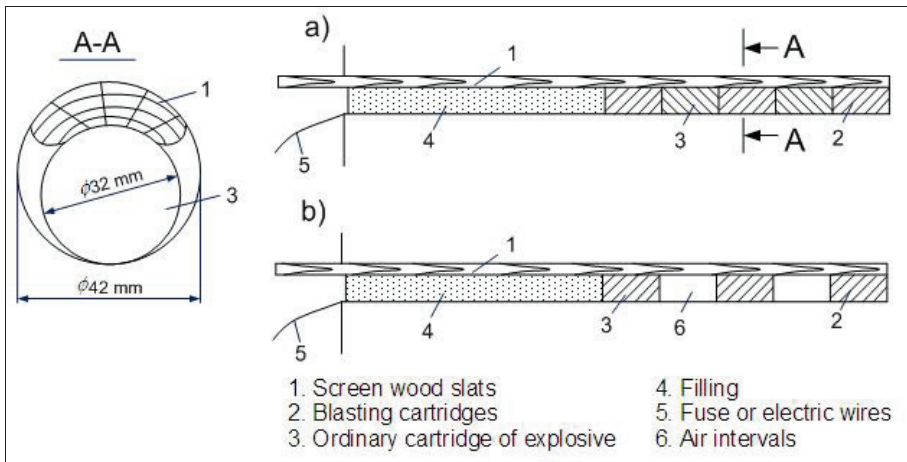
View of explosive charges construction of contour holes for smooth blasting:
